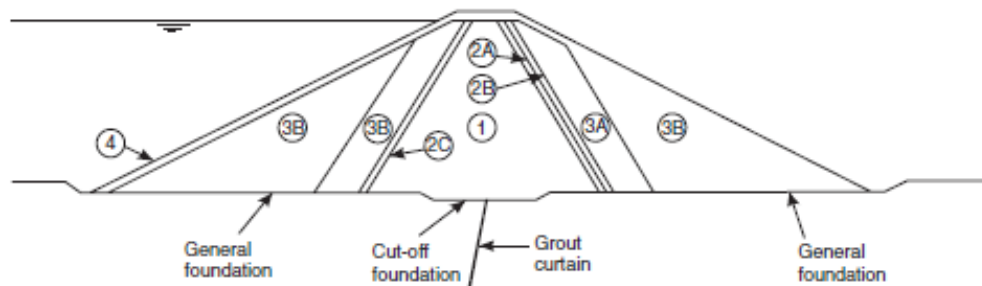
Typical Embankment Dam Section with Central Clay Core. (Key; 1 - Impermeable Clay core, 2 Filters/Transition Zones, 3 - Rock fill 4 - Rip Rap or Concrete face). Adopted from Robin Fell et al, 2005 (Geotechnical Engineering for Dams)
